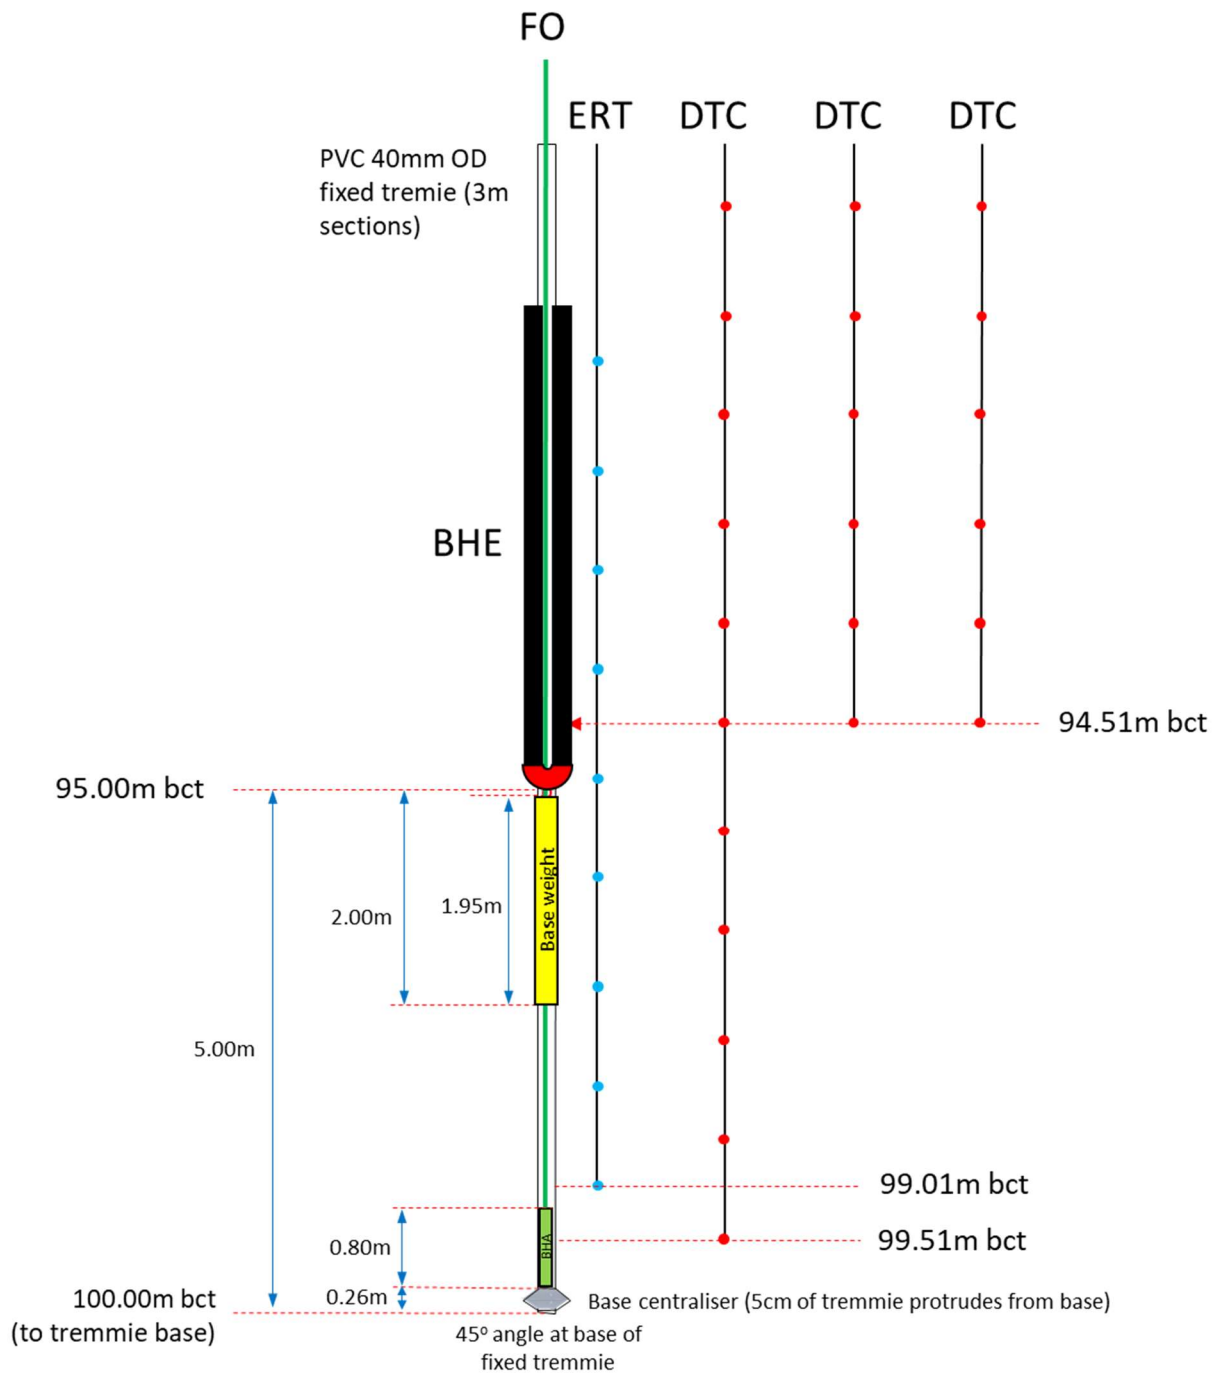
Bottom hole assembly schematic for TH0417 showing depth of install and each sensor string
